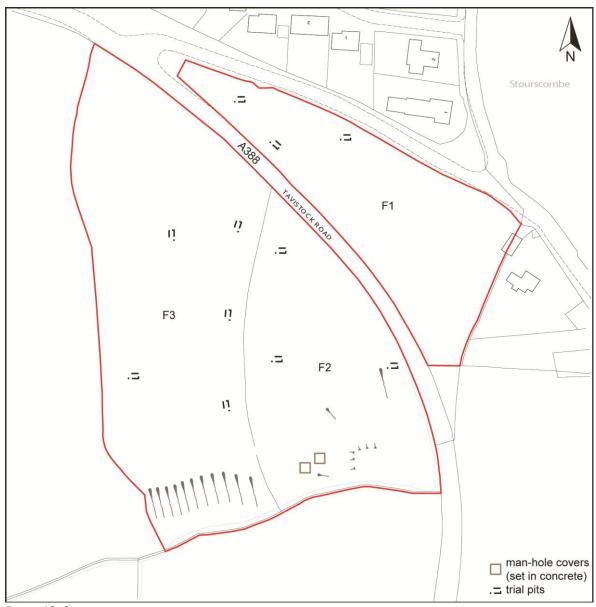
SITE PLAN SHOWING FIELD DIVISIONS AND APPROXIMATE LOCATIONS OF FEATURES NOTED DURING THE WALKOVER SURVEY.
